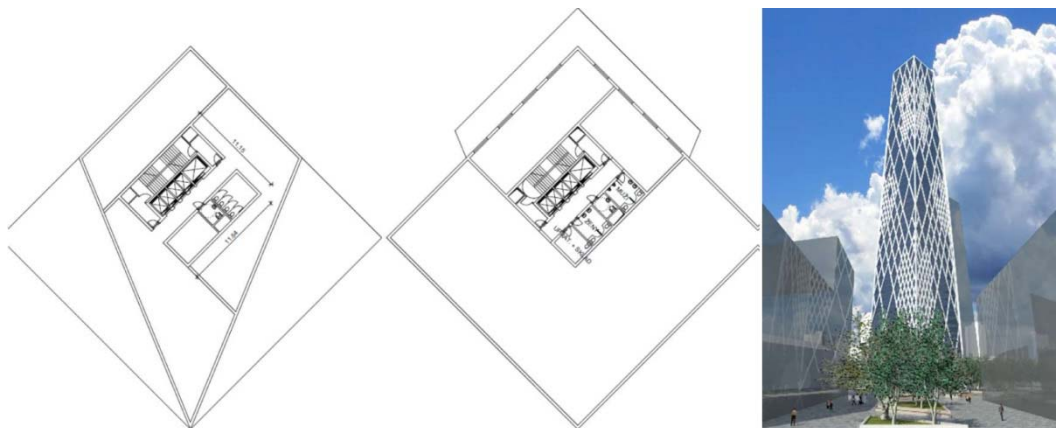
Top floor plan, ground floor plan, visualization according architectural study
